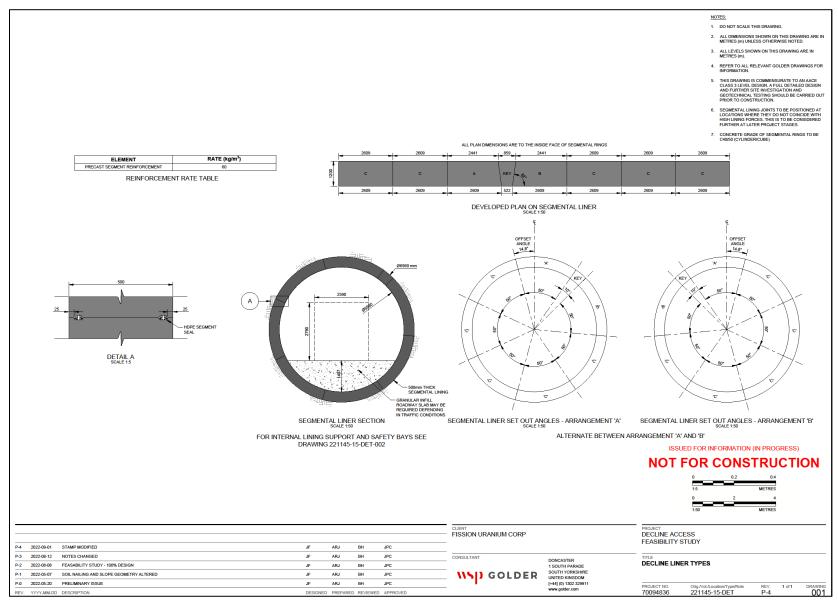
Decline Liner Section and Concrete Segment Arrangement
